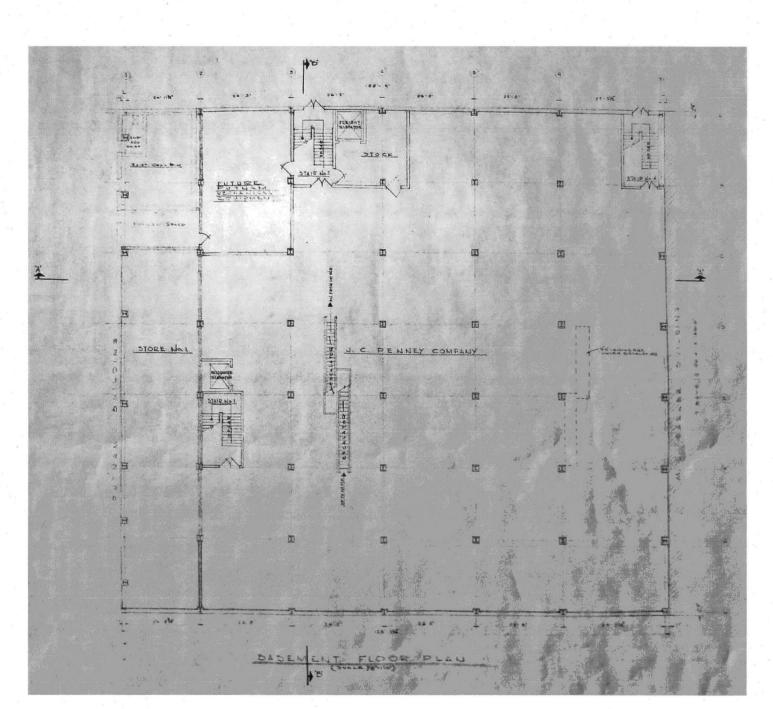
Layout of basement of Putnam Center Building (Putnam Trust collection, unprocessed drawings).
